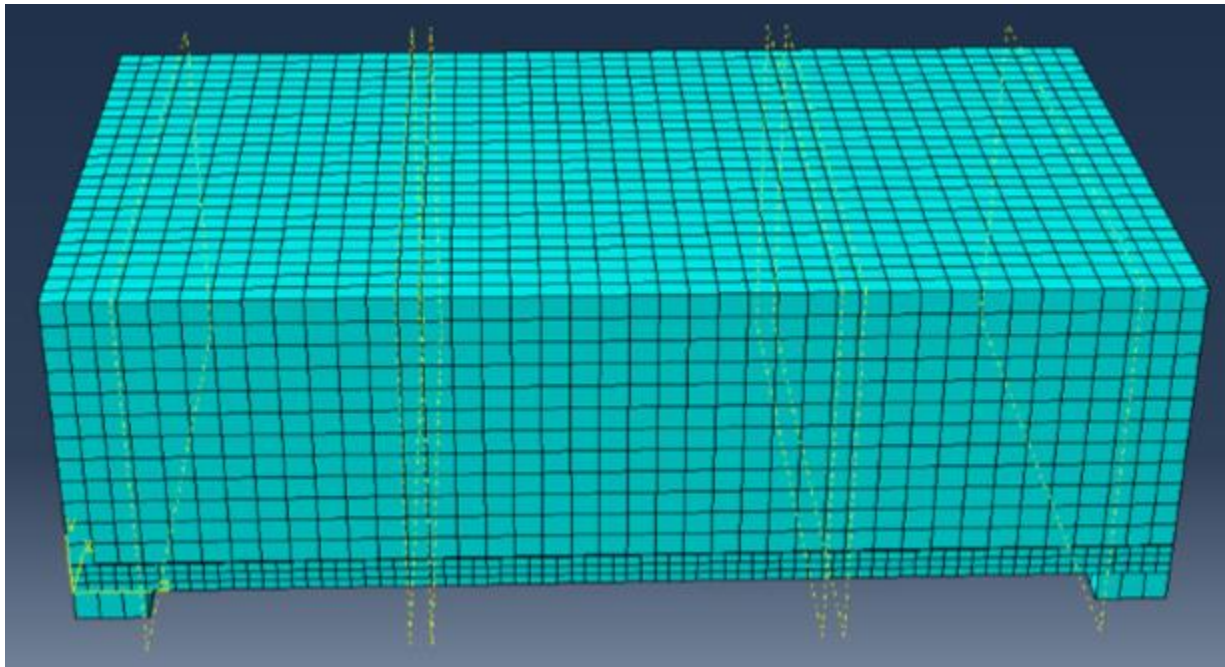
Model of meshed ECC strengthened masonry wall (FW-A)
